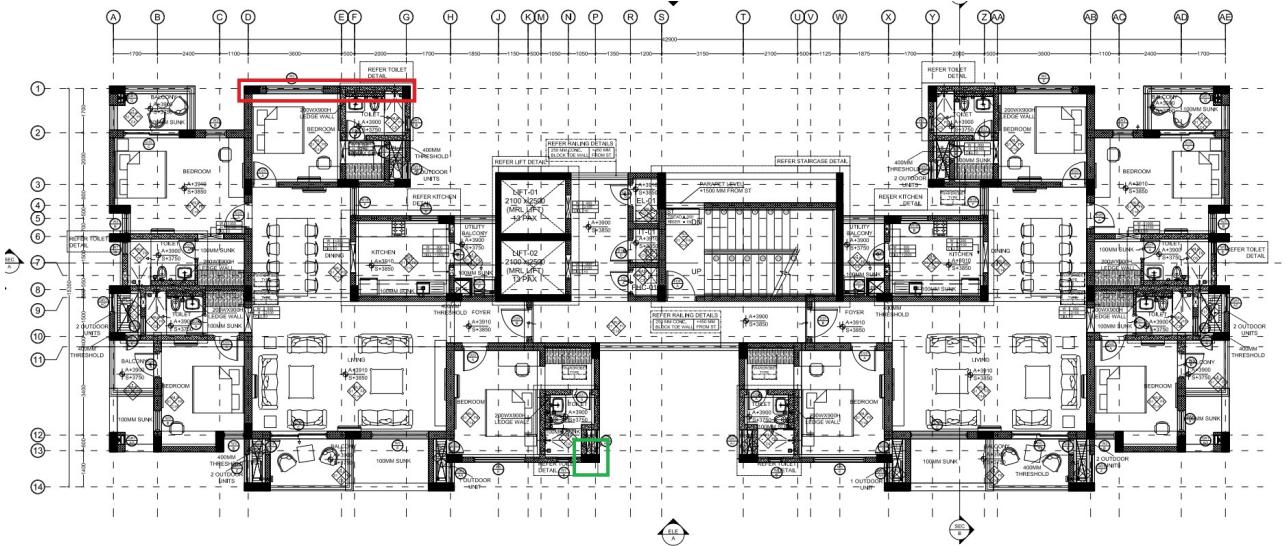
Layout of 1st floor plan, Detailed design is performed for the highlighted beam and column(and footing)
